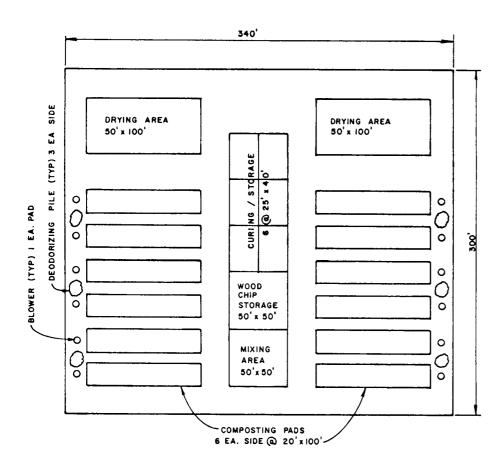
Static pile forced aeration composting system plan (4 Mgal/d activated-sludge plant).
